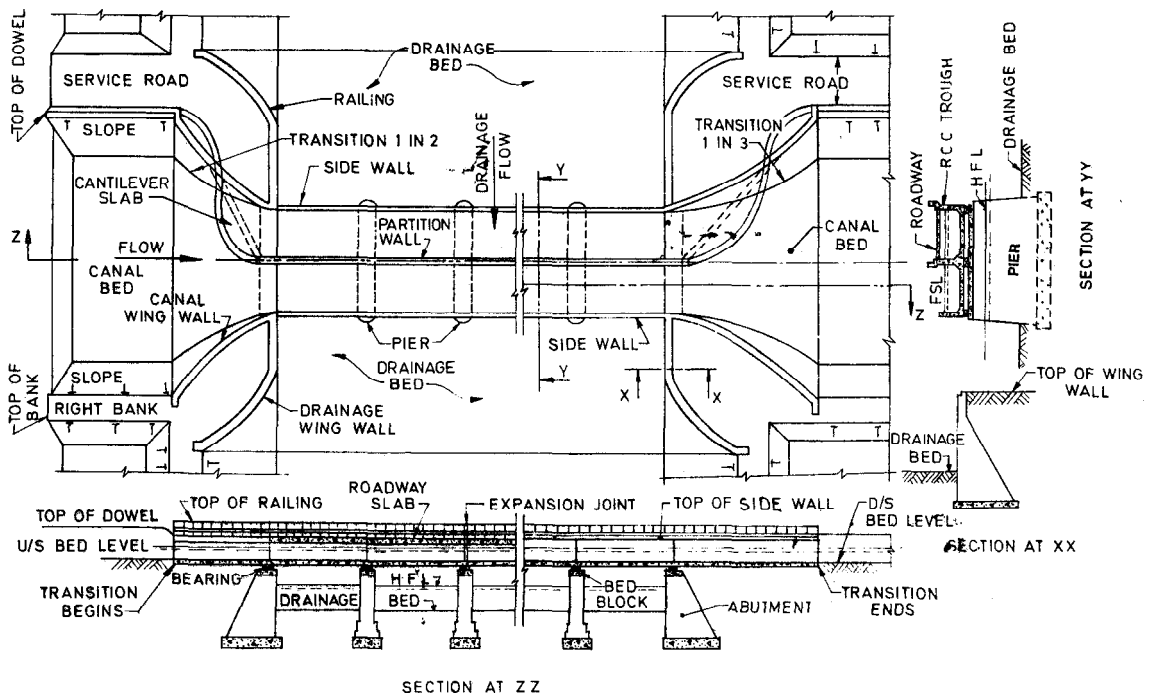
TYPICAL PLAN AND SECTION OF AQUEDUCT
